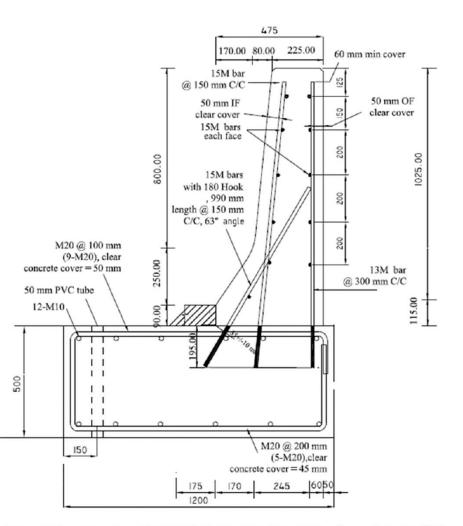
Barrier specimen B-6 details (Exterior Location - No Cantilever - Post-Installed)
